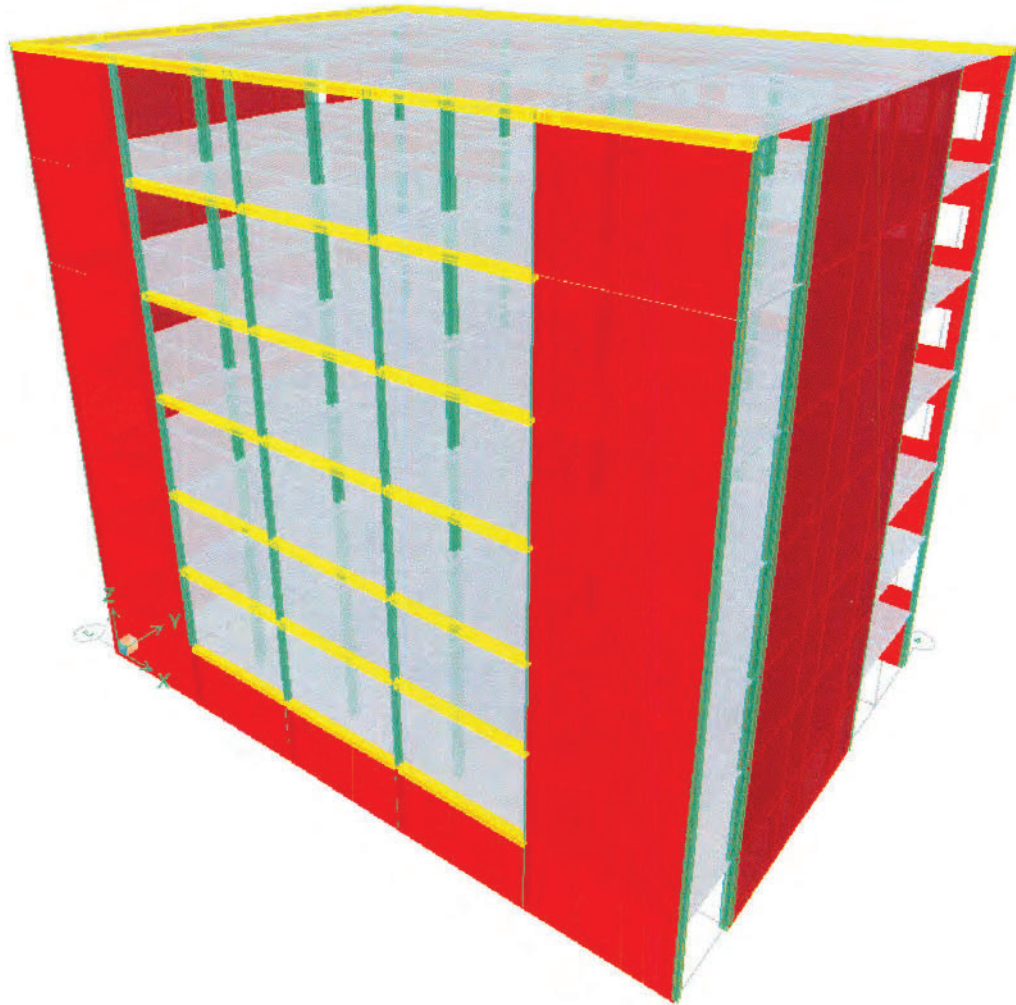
The Separated Part of the Annex Building Beyond the Fault Zone (North-East View, Added Shear Walls)
